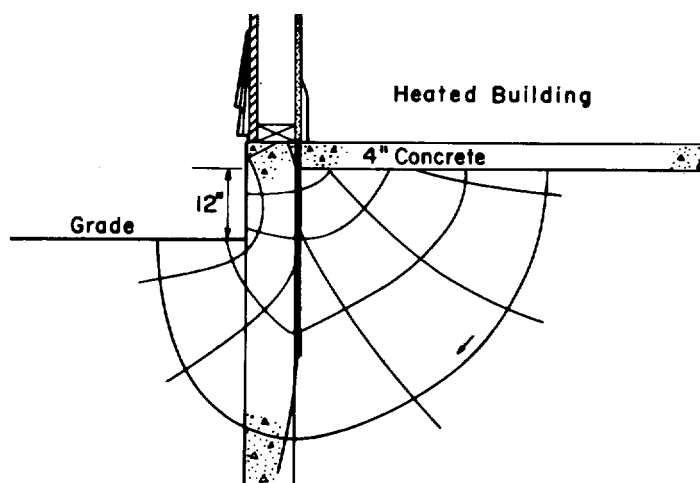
Flow net, concrete slab on grade, insulated⁴¹.
